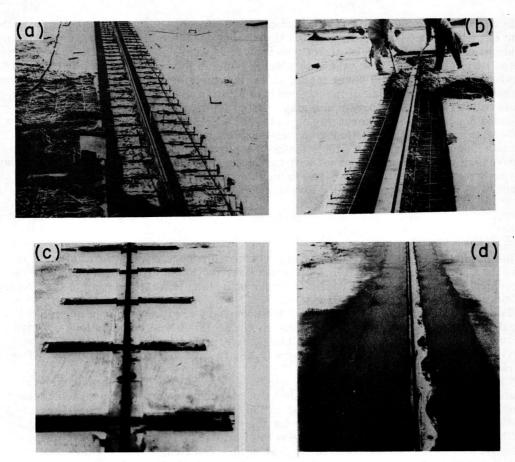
Hopsten Airport, Germany. Stages in construction of a joint using the Dywidag method: (a) cables placed and connected to central steel railing; (b) concrete hand placed in joint leaving room for jacks; (c) joint ready for jacking; (d) finished joint.
